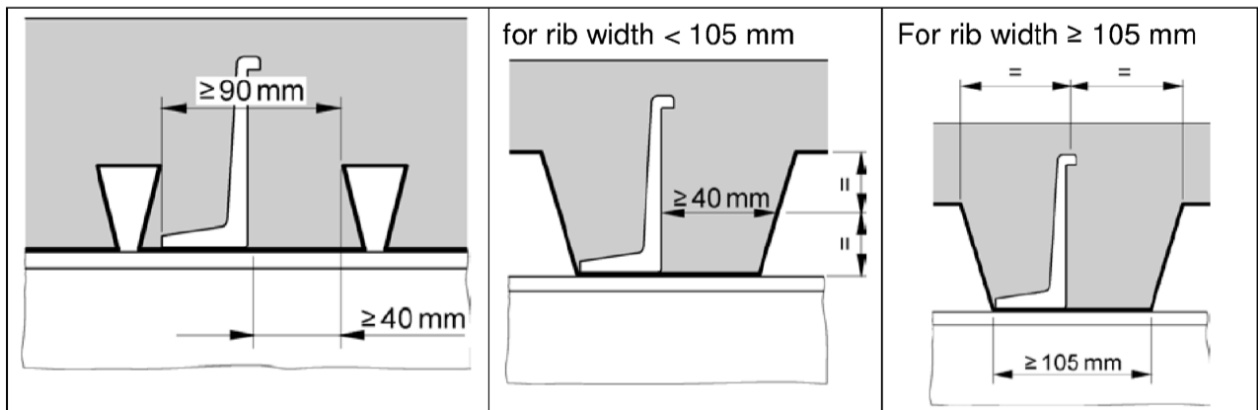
Spacing of connectors for slabs with transverse decking and connectors parallel with the beam (single row).
